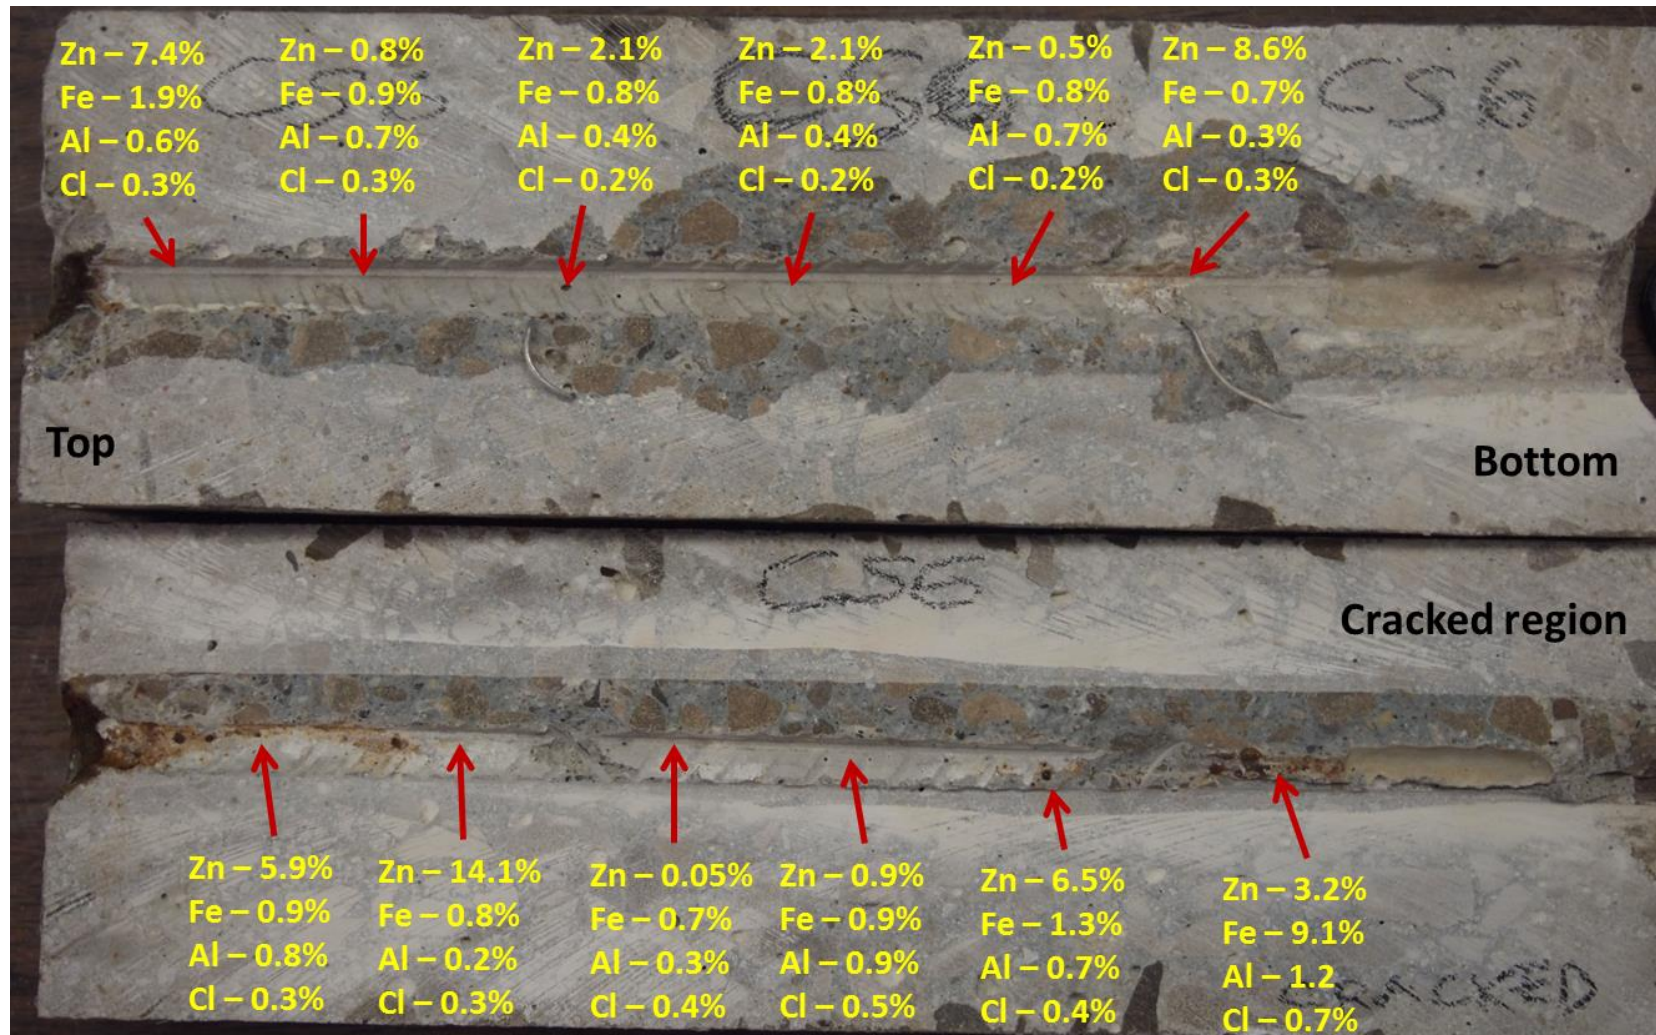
XRF analysis of autopsied longitudinally cracked C2 concrete specimen
